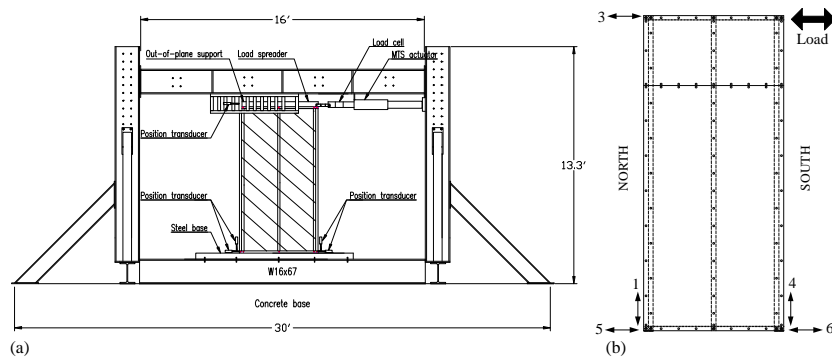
Schematics of (a) testing rig with specimen, and (b) sensor plan on specimen, arrows and numbers correspond to position transducer locations.
